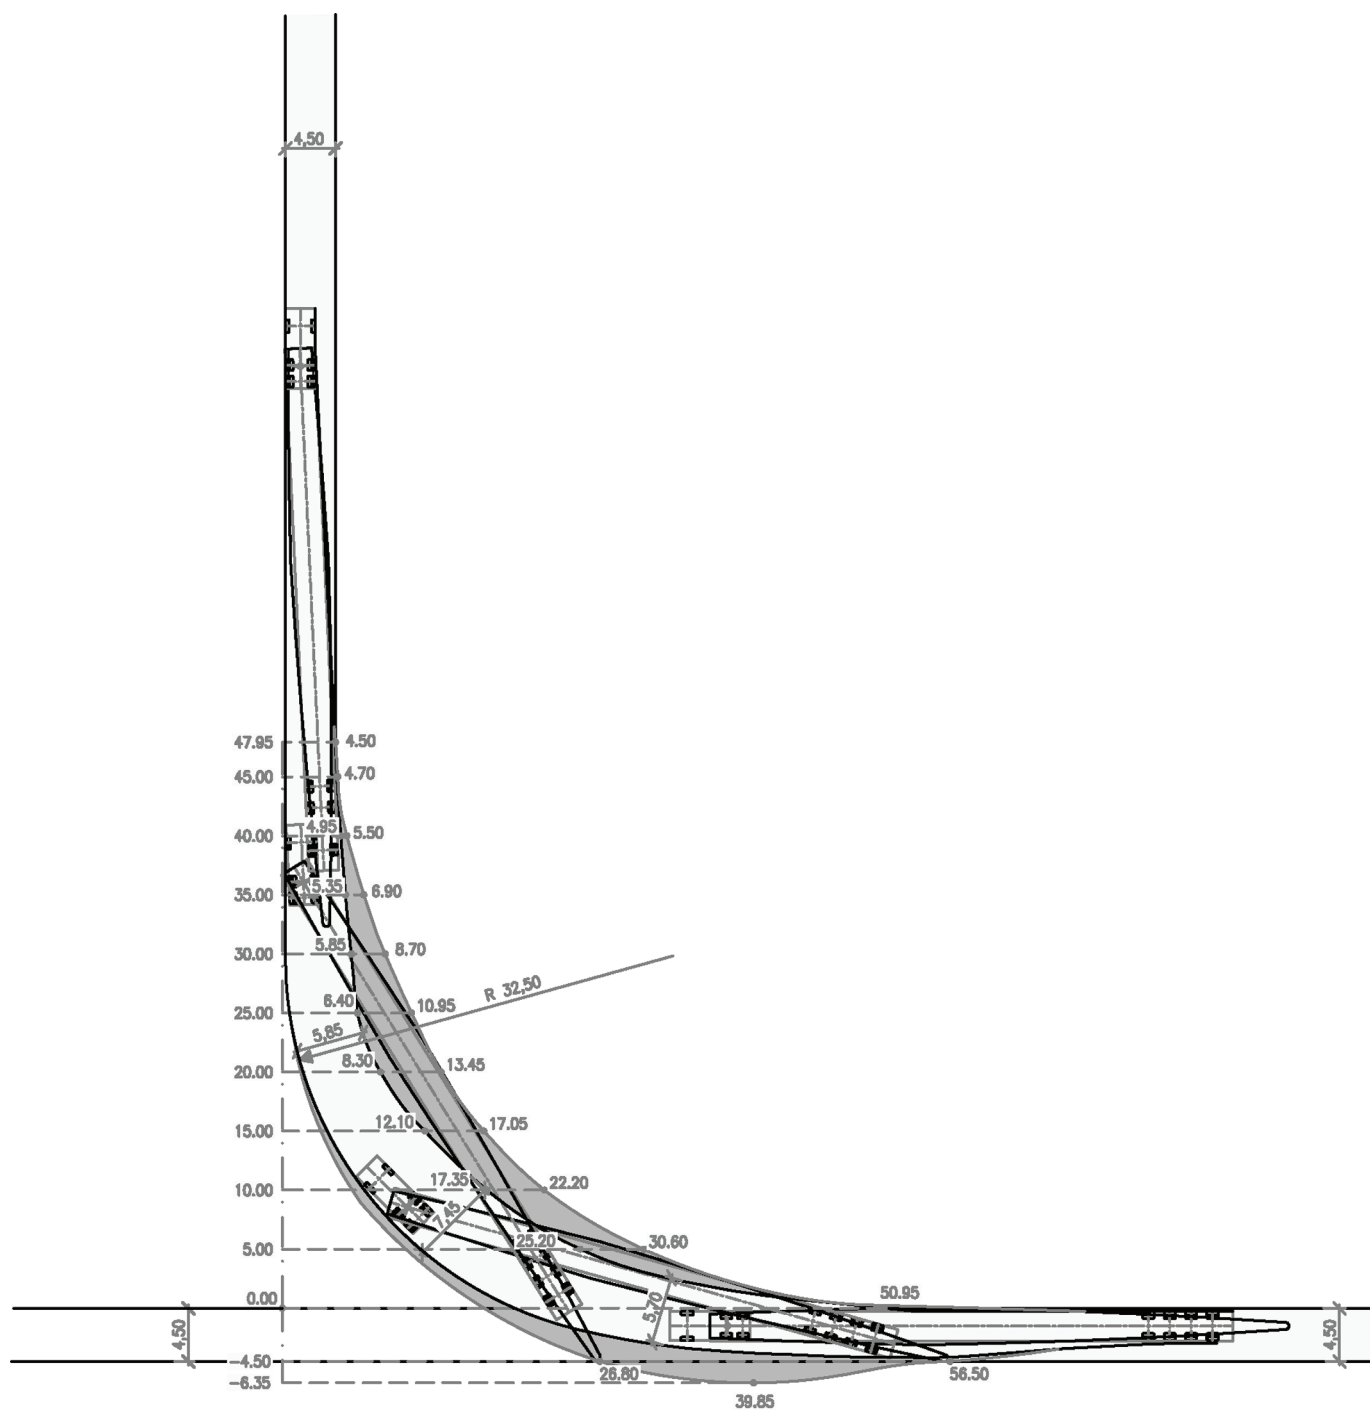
Truck with rear axle steering, outside radius 32.5m / turning angle 90°
